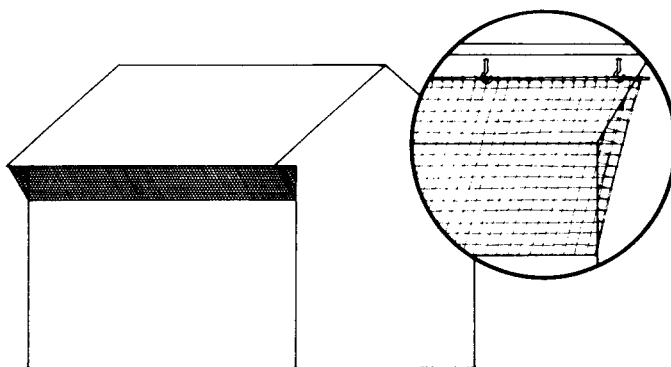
Netting mounted on building from outside edge of eave down to the side of the building. Insert shows a method of attachment using hooks and dowels.
